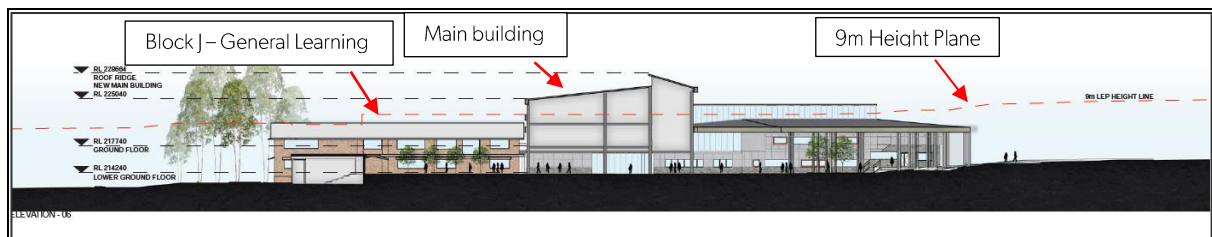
| East elevation – General arrangement (source: EIS 2018)
